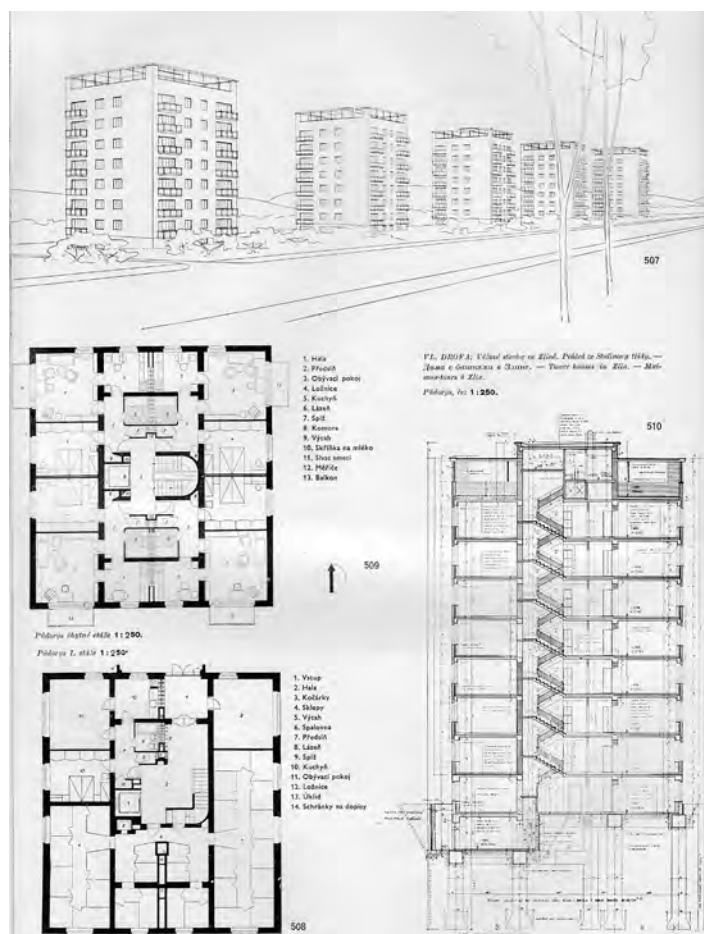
MIROSLAV DROFA, PLAN FOR TOWER BLOCKS, ZLÍN, 1946–1947.
